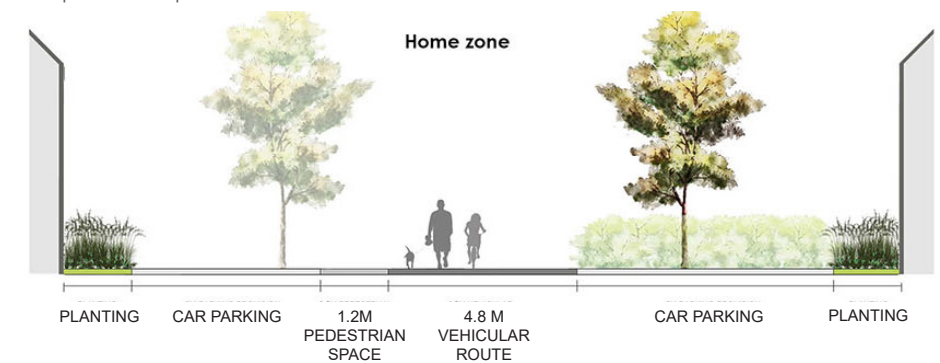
Street sections illustrating the detailed design for local streets and homezones.
